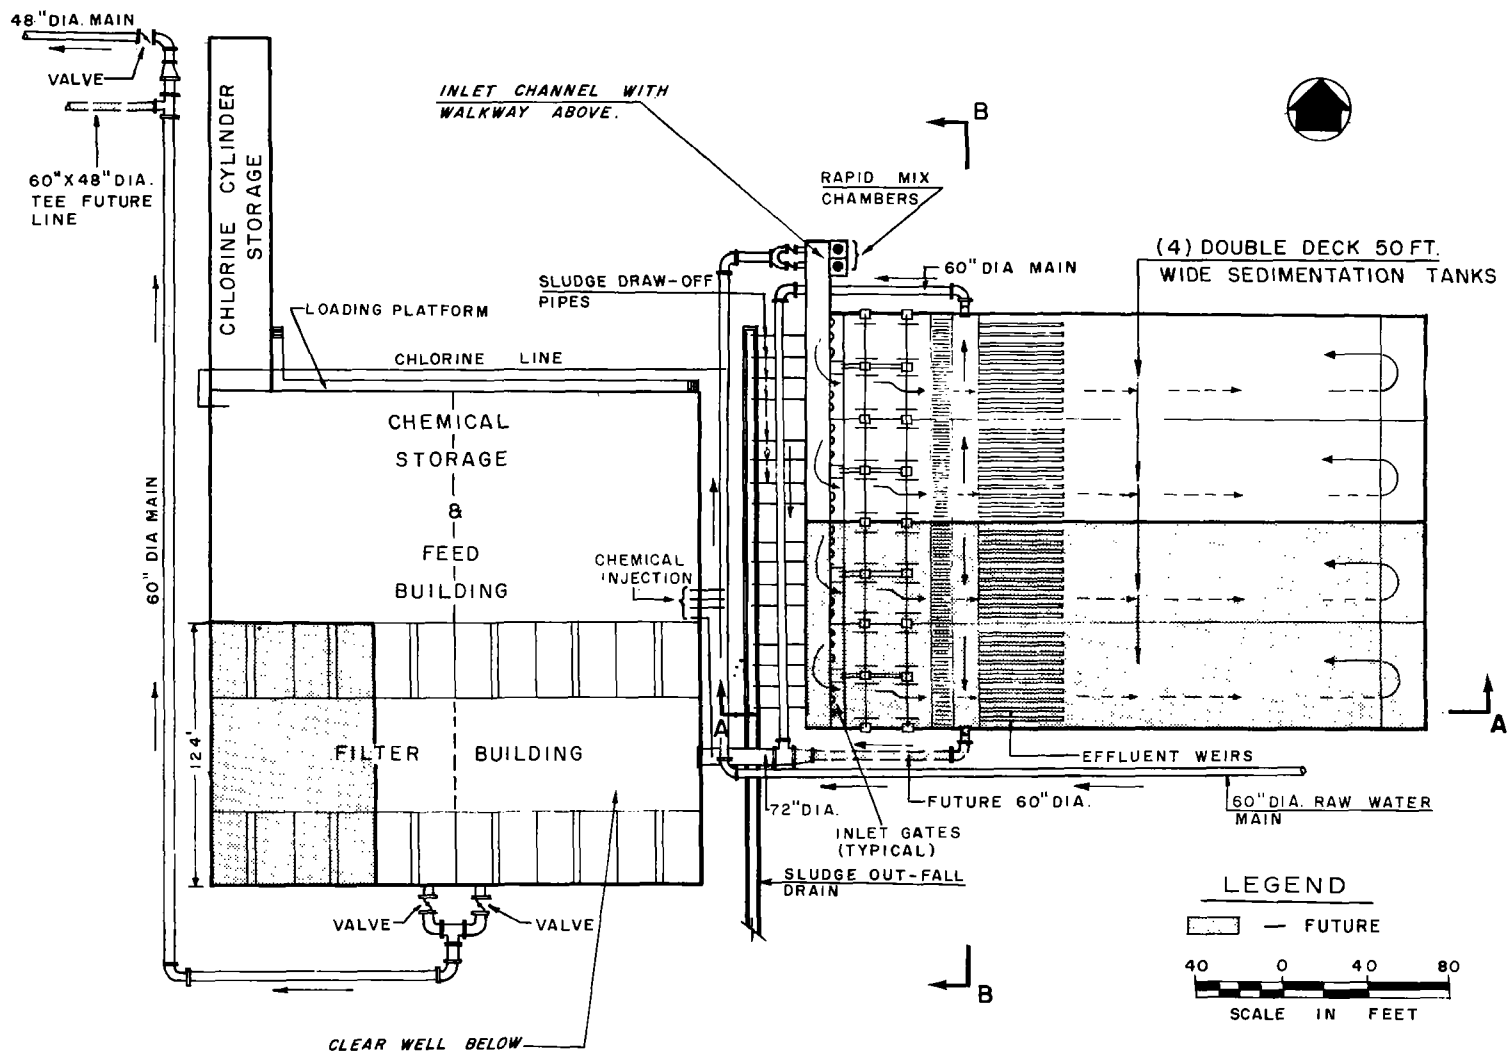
OROPOUCHE WATER TREATMENT PLANT — PLAN
